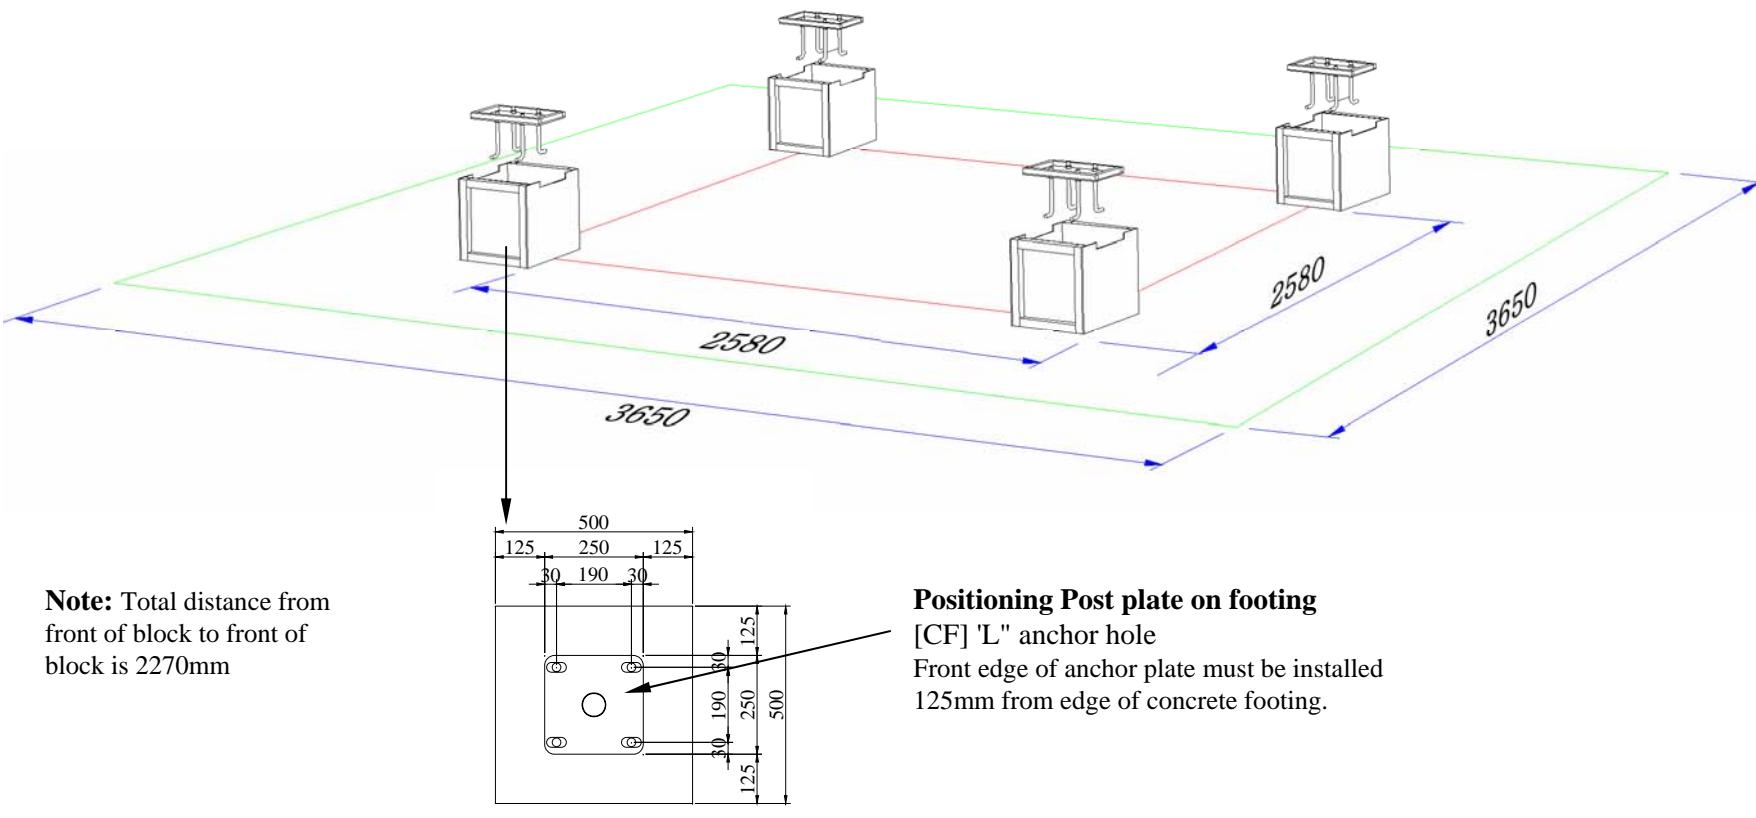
Excavate enough materials to allow for proper depth of concrete footings
